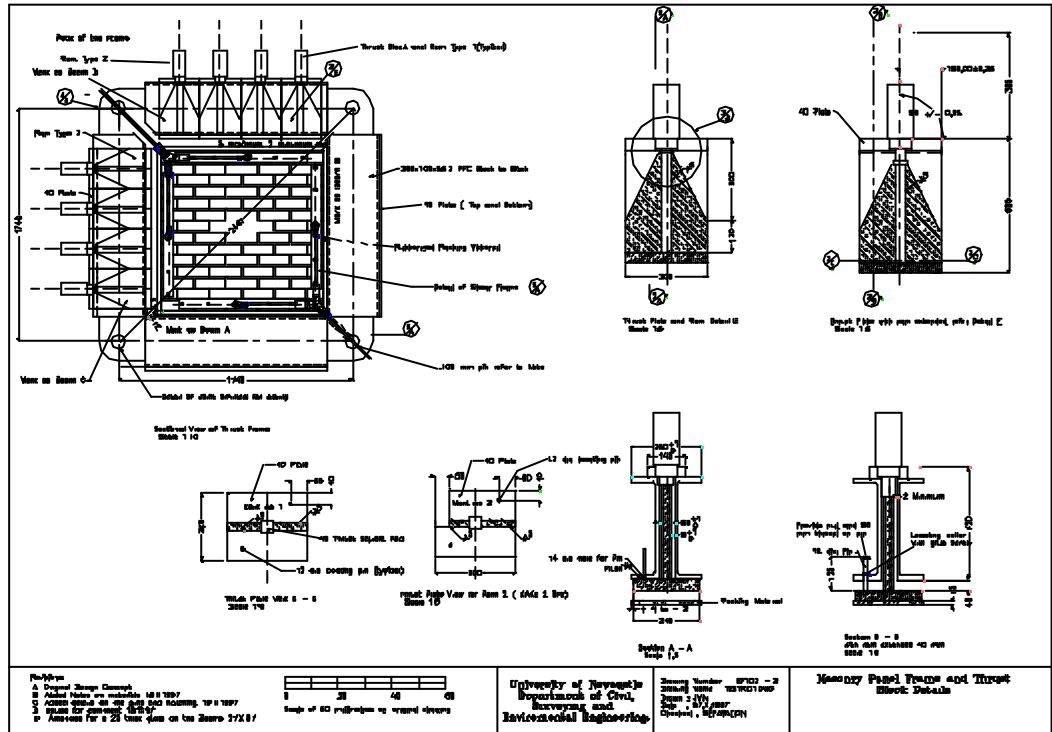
EF102 - 2 MASONRY PANEL FRAME AND THRUST BLOCK DETAIL
